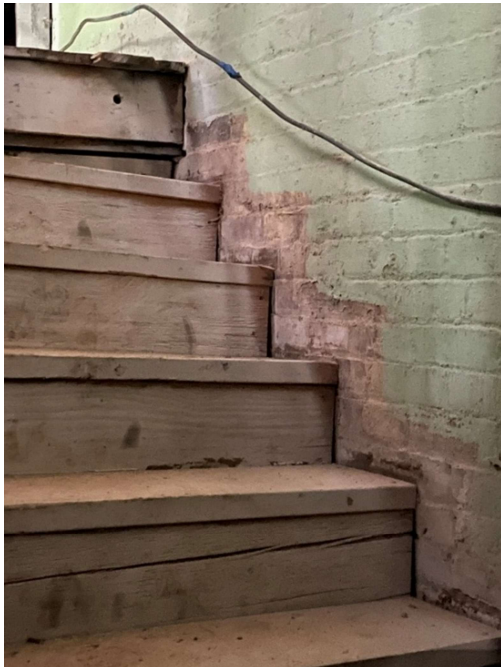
Stairs to Basement Level Figure 38: Underside of Stairs to Basement Level
